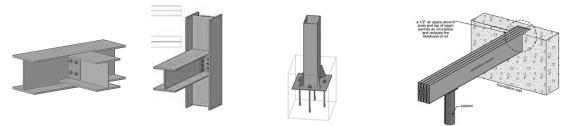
Different types of unions: Beam to beam, Beam to column, Column to base plate and pocket beam.
